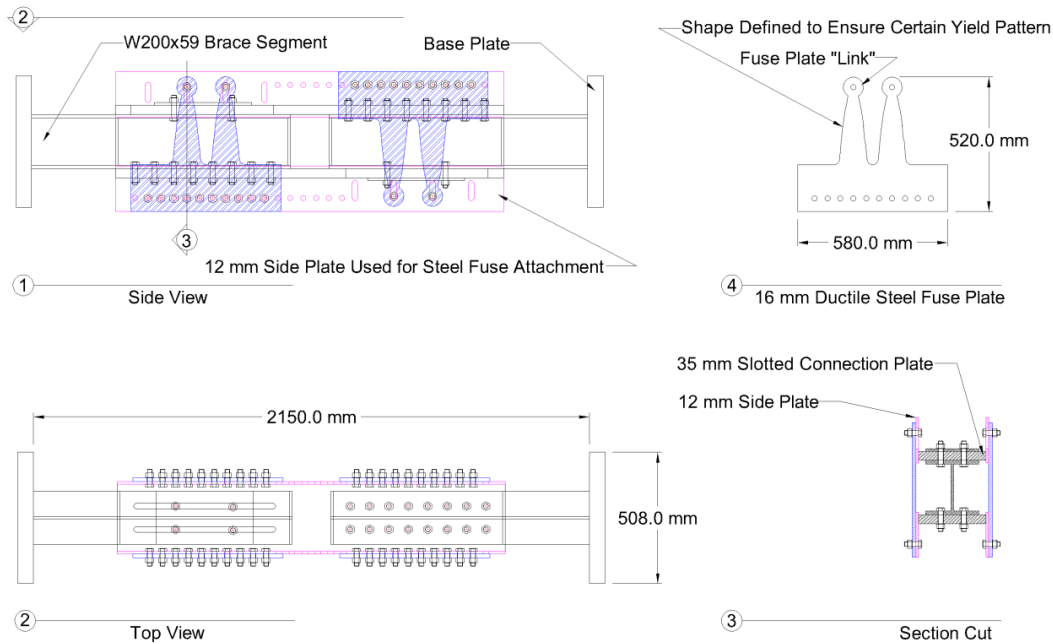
Prototype Diagonal Brace Specimen - Design Blueprint
